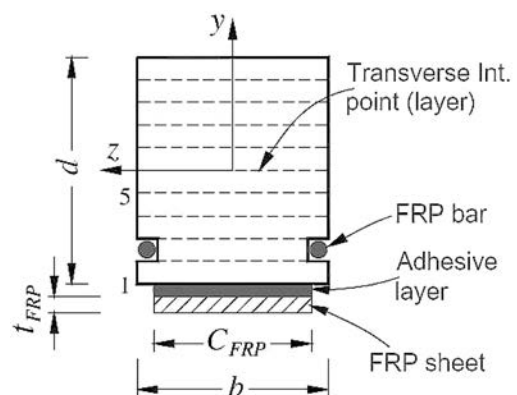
Glued laminated timber beam reinforced with composite rods and tapes [7]
